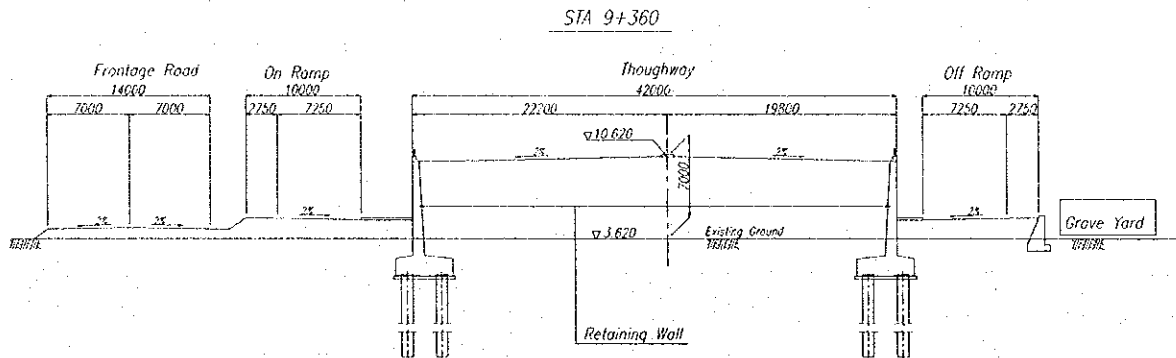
Typical Cross Section of Part with Retaining Wall
